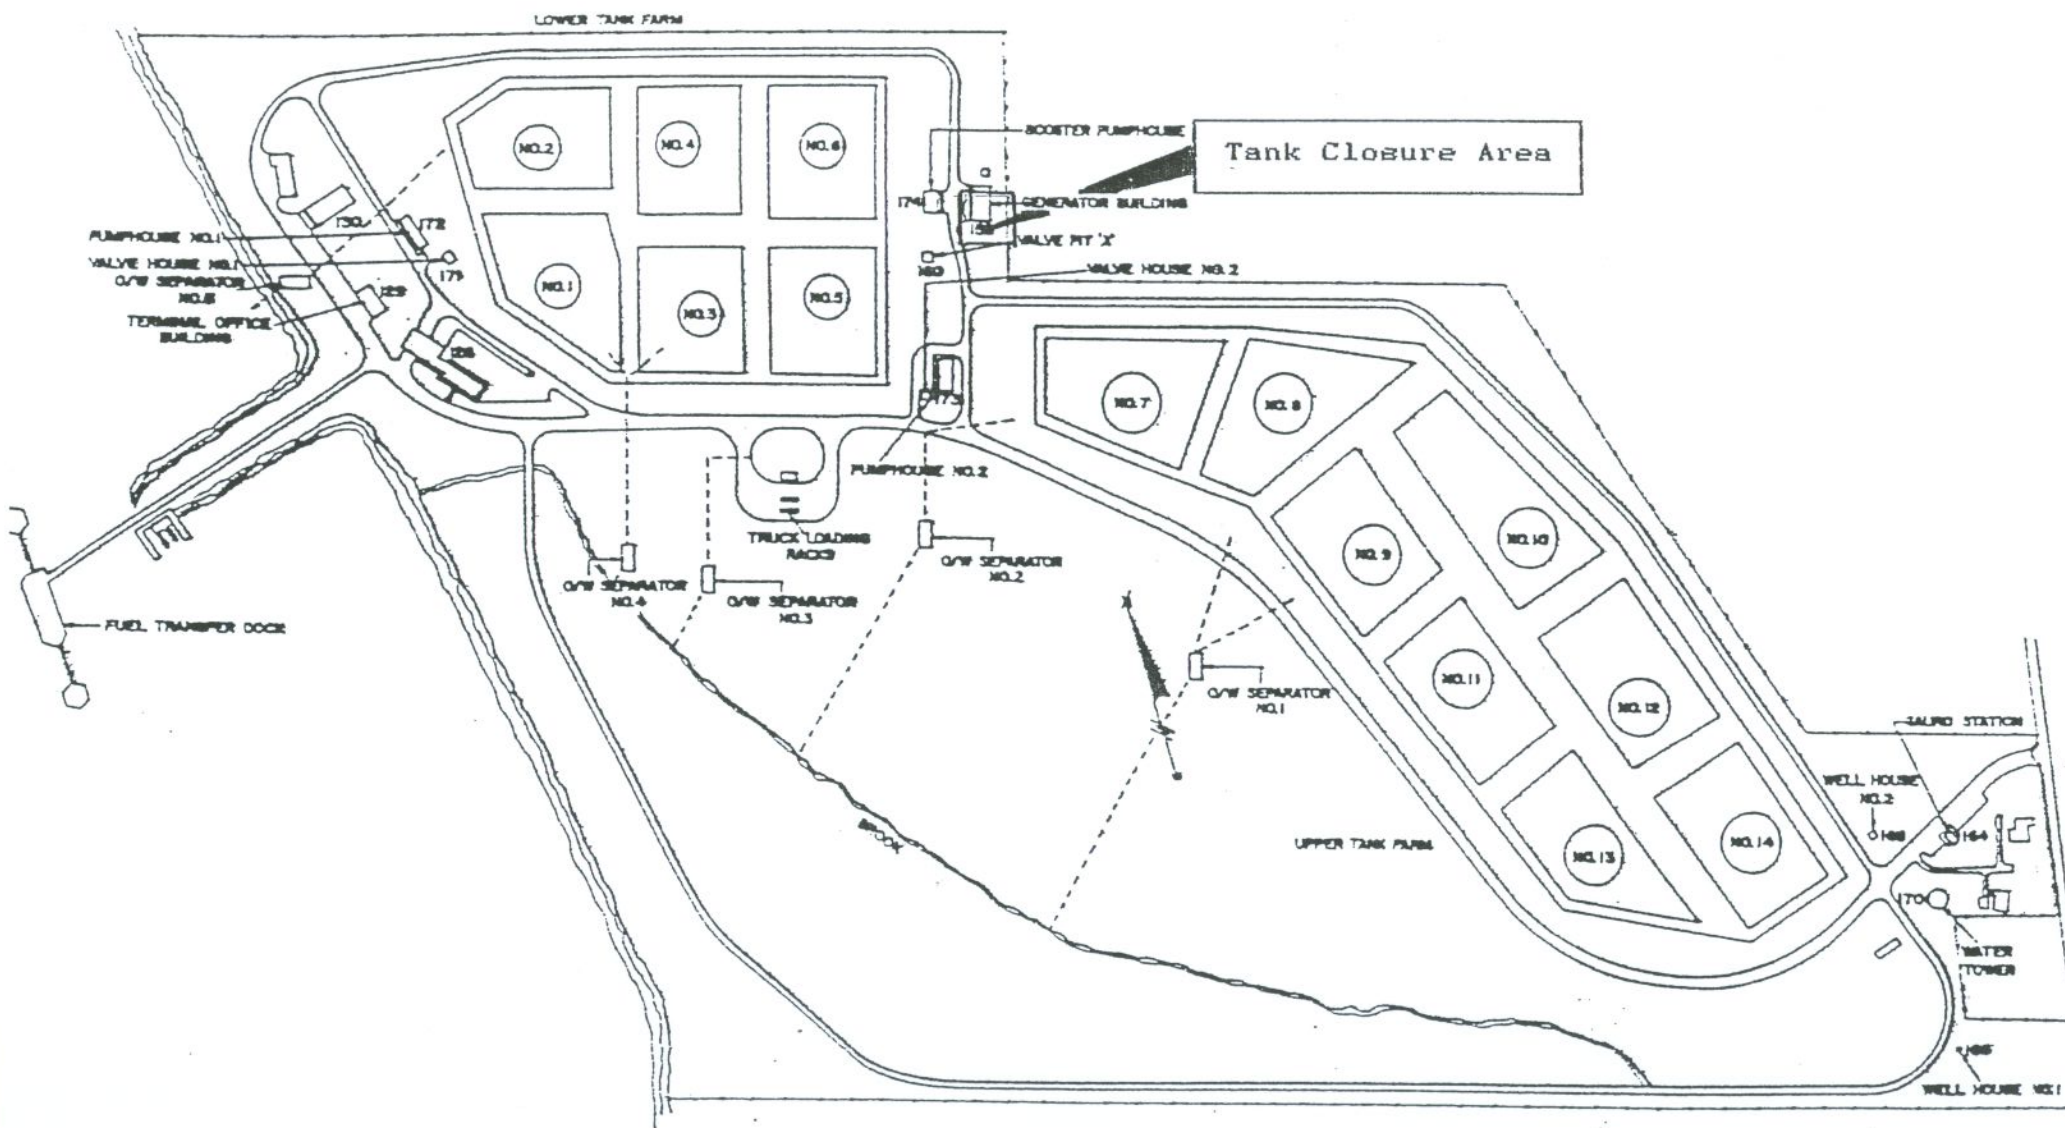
DFSP CASCO BAY, FACILITY LAYOUT
